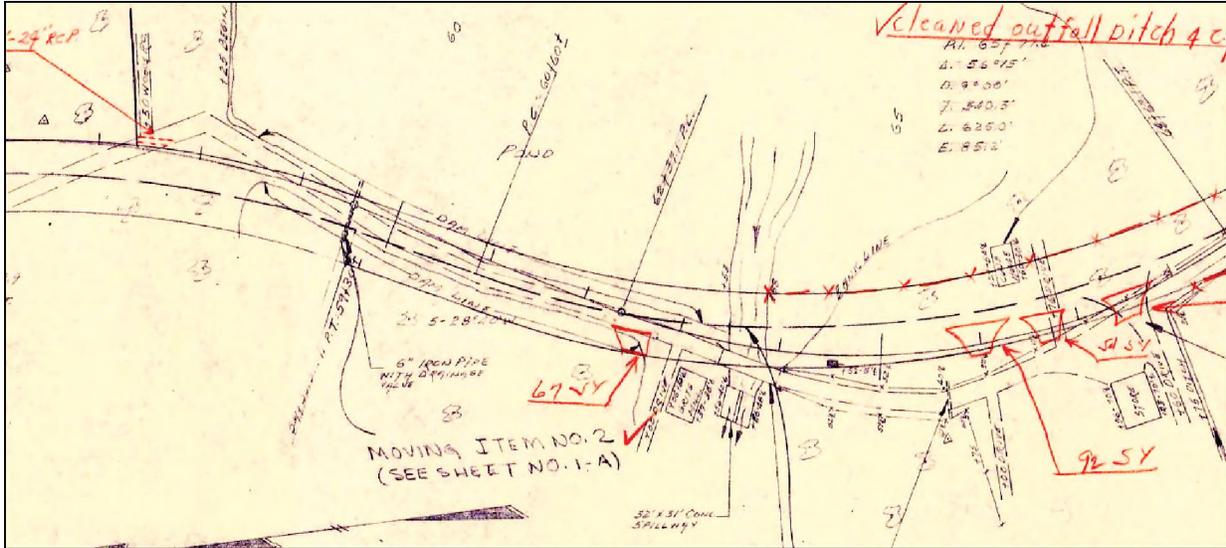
Portion of 1963 South Carolina Highway Department As-Built Plans.
